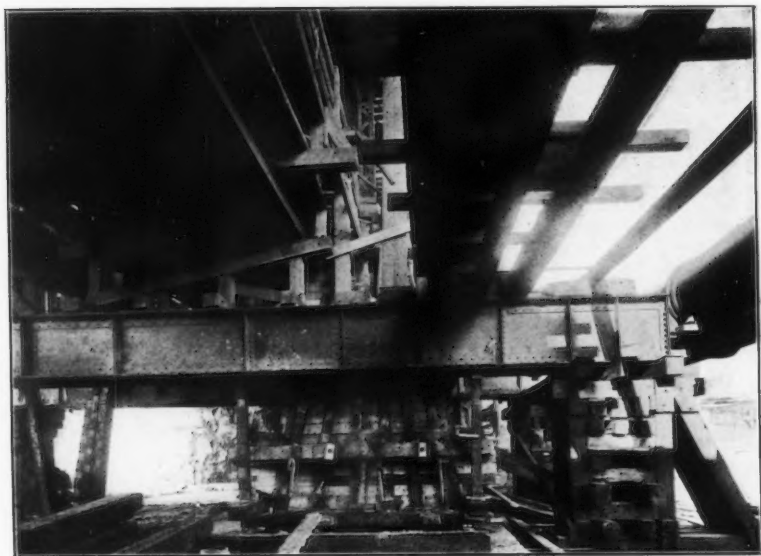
FALSEWORKS AND CONCRETE PIER FOR SUPPORT OF ELEVATED RAILWAY,
